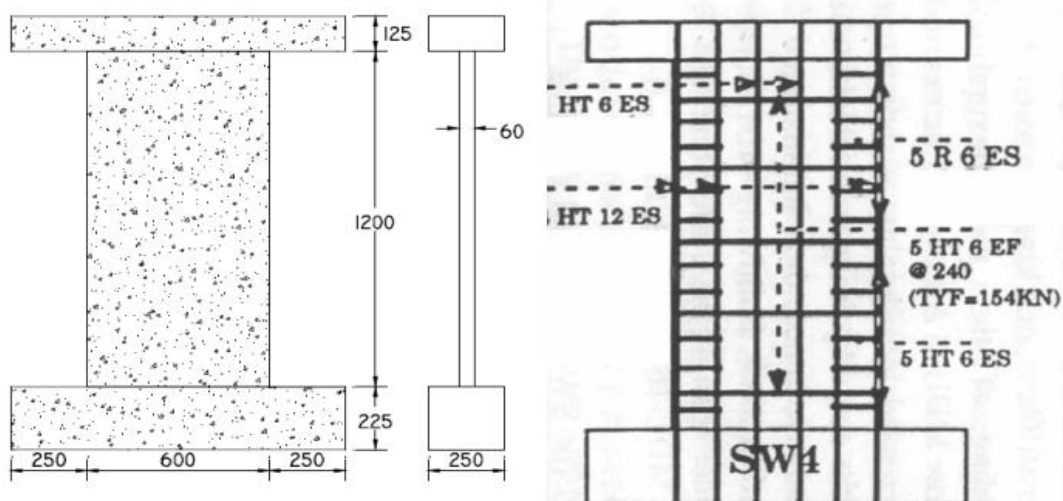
Geometric and reinforcement details of Shear wall SW4 [9].
